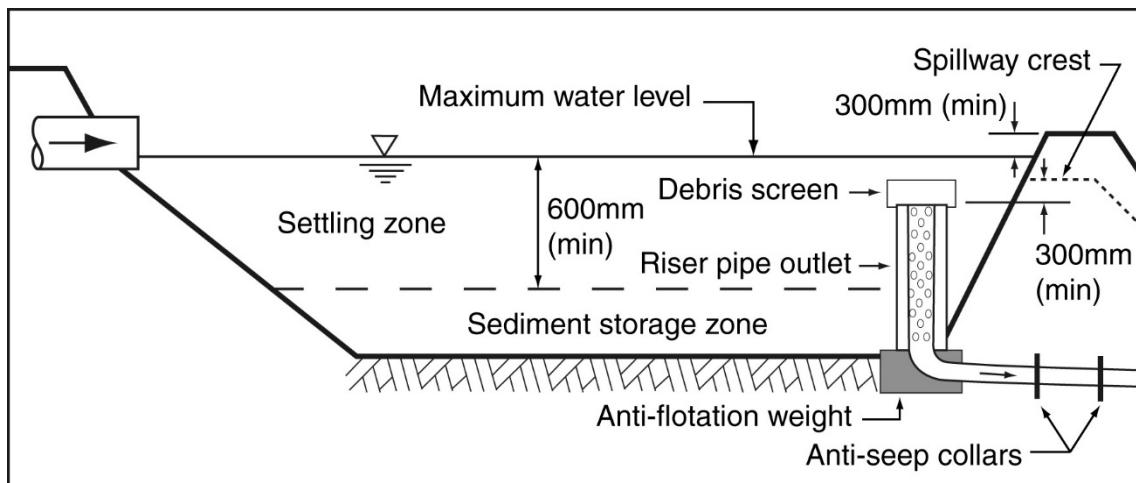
Type C sediment basin with riser pipe outlet (long-section)
